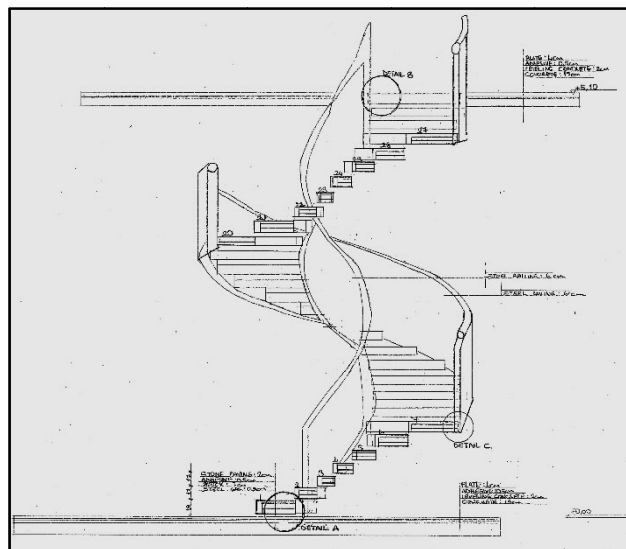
Student work II (Defects that are related with technical drawing knowledge).
